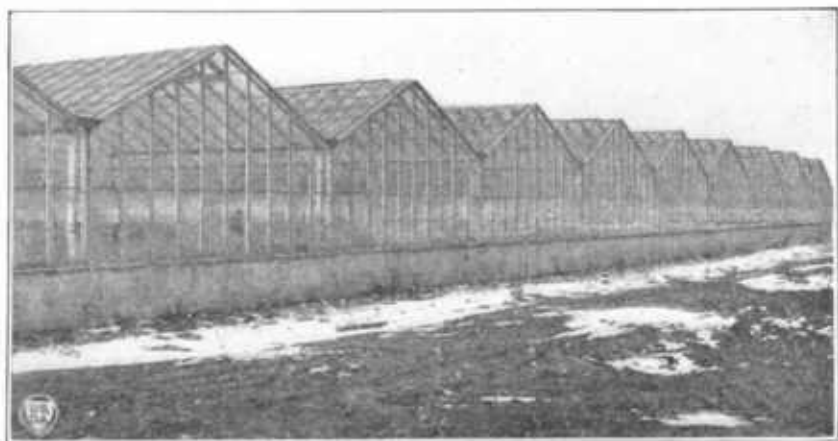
Exterior of a range of ridge-and-furrow greenhouses.
